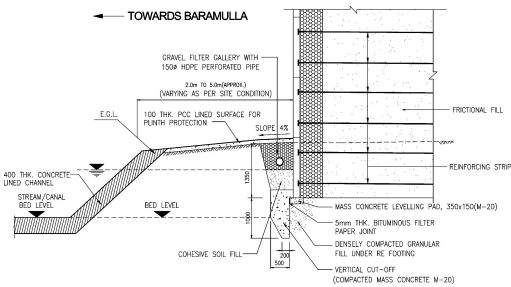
Typical toe detailing adopted for reinforced earth wall near canal.
